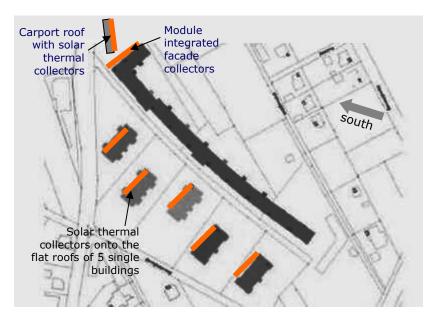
Site plan showing the solar thermal collector areas. (Source site-plan: Hohensinn ZT GmbH)
